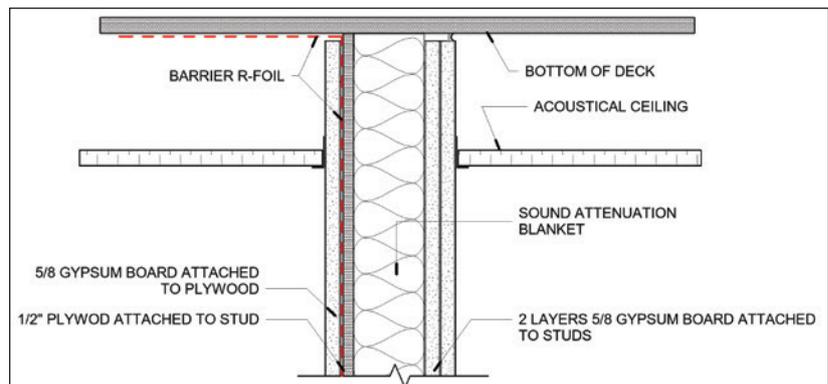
One of three wall sections presented in ICD/ICS-705 depicting an RF barrier
